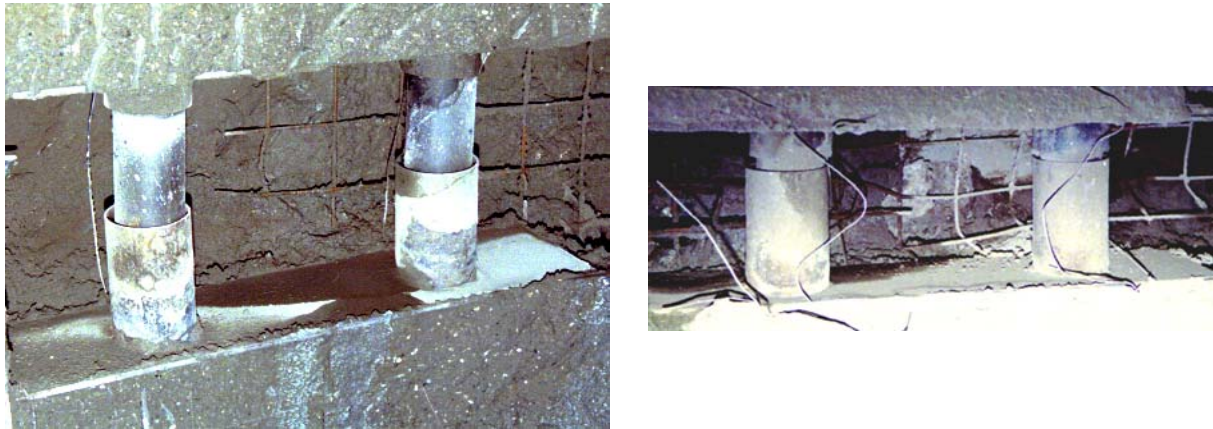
LSC A/I type unit installed in deformation gaps before (left) and after (right) deformation
